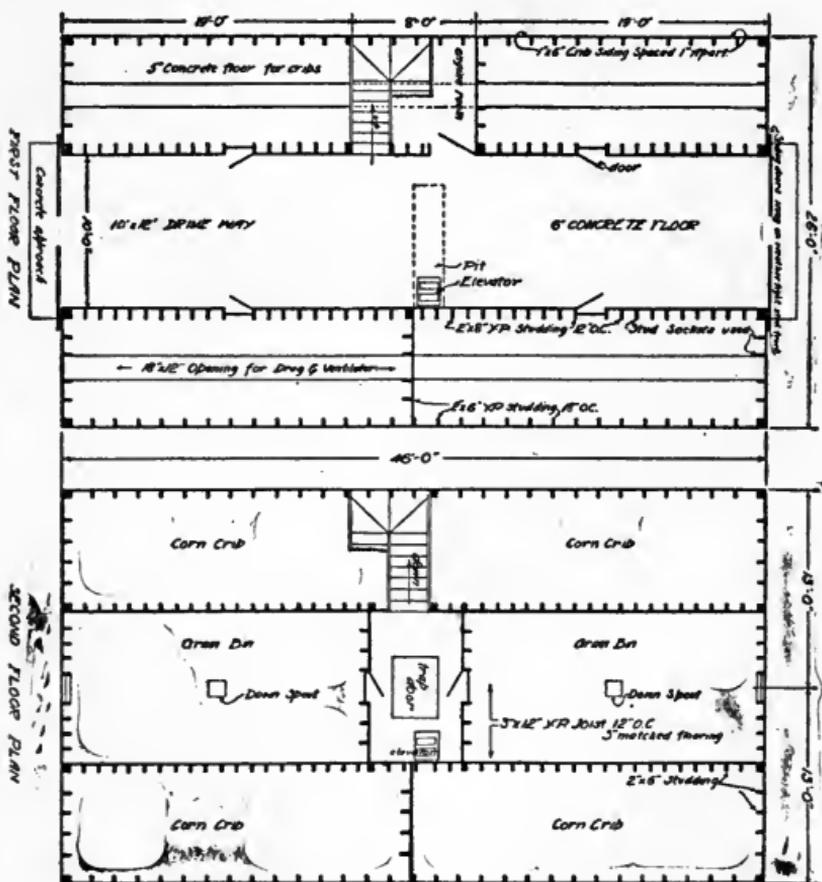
Floor Plans of Two-Story Corn Crib. The First Floor Shows the Driveway with Corn Cribs at the Sides and the Second Floor Plan Shows the Grain Bins Over the Center Driveway, with Location of the Downspouts, Stairway, etc.
